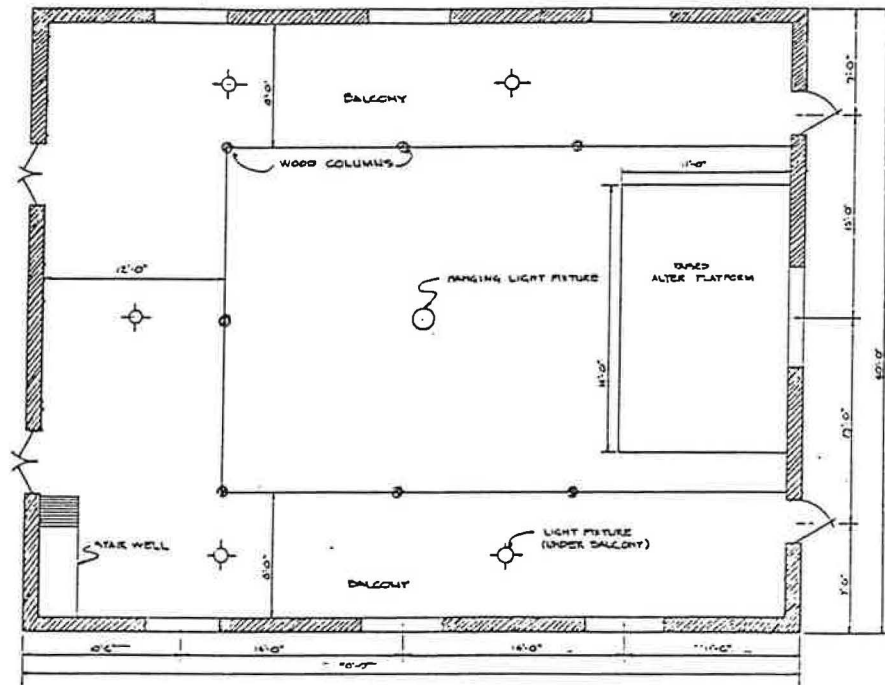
Exhibit B. Liberty Baptist Church floor plan. Based on "Liberty Chapel, Bldg. # 250," Drawing No. 65-28, from Fort A. P. Hill buildings and grounds records. Scale: 1" = 12'-6".
